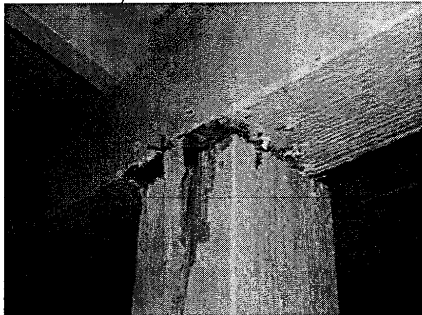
Damage to the timber canopy outside the house (Photo: Chadwell).
